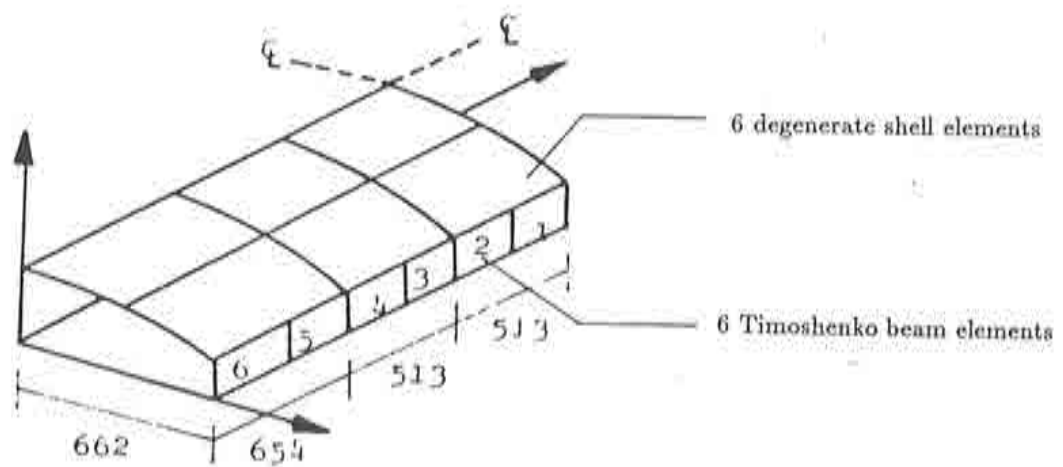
Cylindrical concrete shell. Finite element mesh of shell and edge beam elements,
